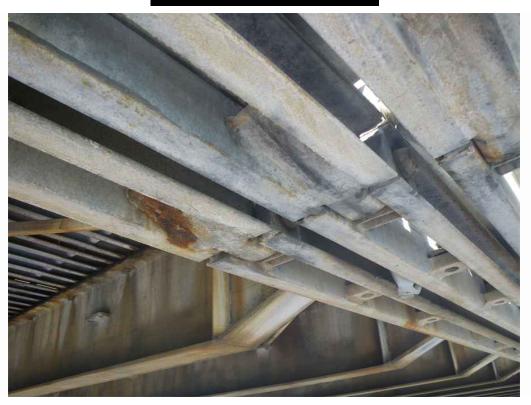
Span 4, East Truss, Lower Chord, Pin Between T17-T18, Underside, Looking Northwest - Loss of galvanization and surface rust.
